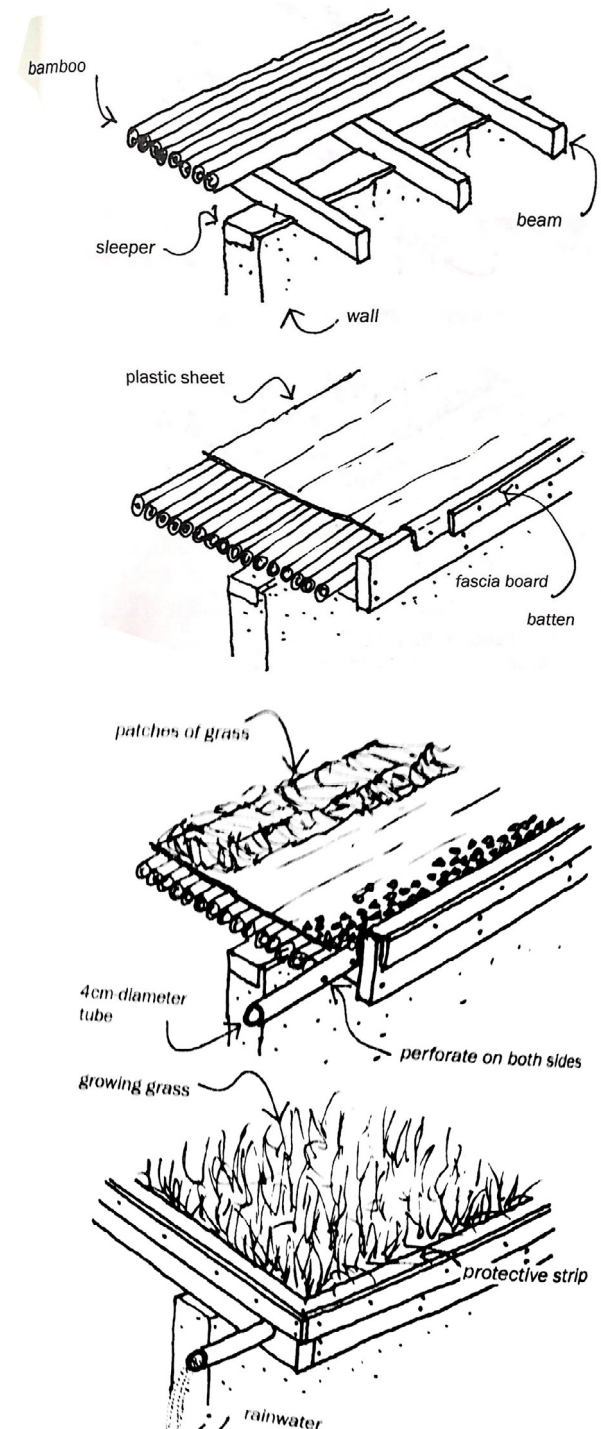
Traditional flat roof construction (Van Lengen, 2008)
